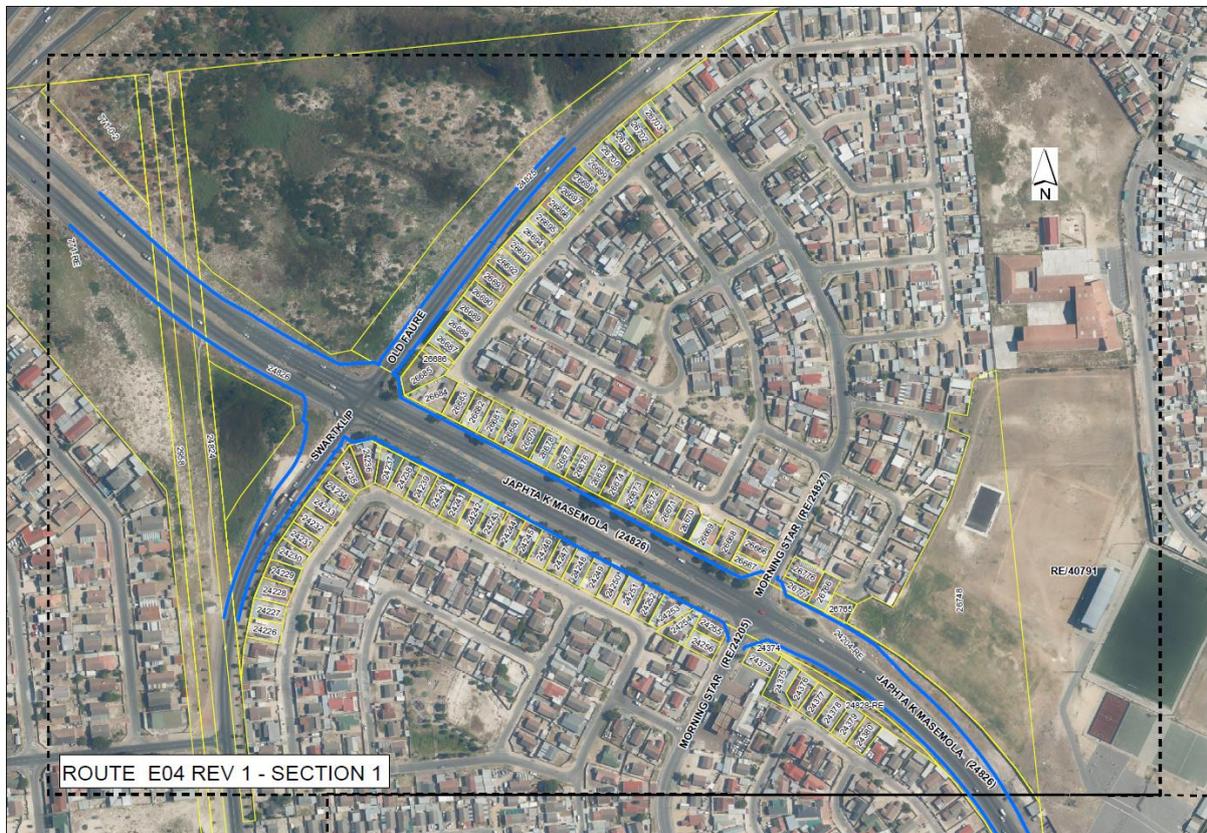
Image depicting sector 1 of the proposed road upgrade along Japhta K. Masemola drive and the Swartklip Road/ Old Faure Road Intersection.
